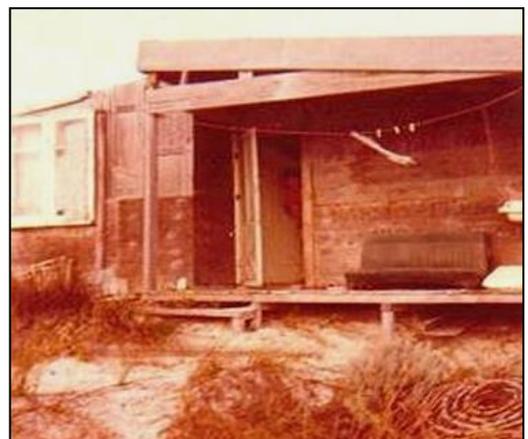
The second Egan shack constructed in 1968 from tractor packing casing timbers with a corrugated-iron roof, using driftwood for roof timbers. (Source Terry Egan)
